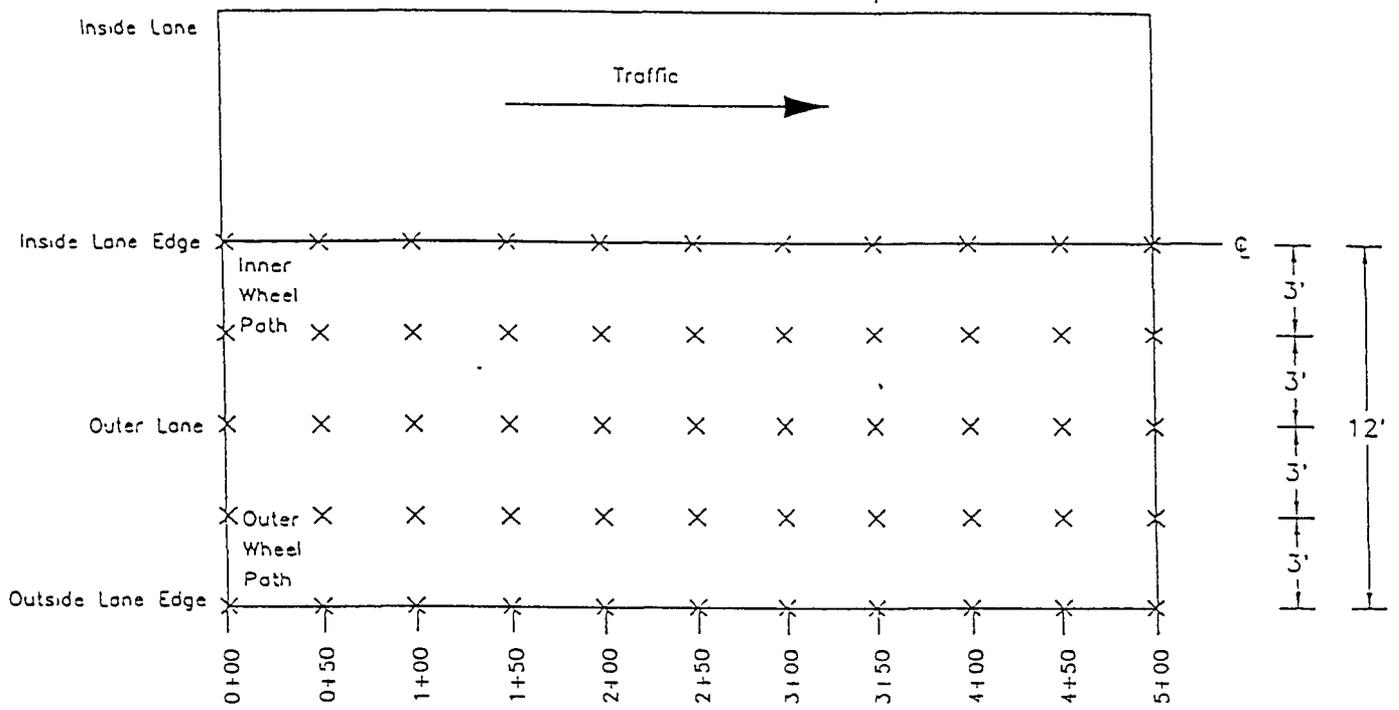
Test section elevation measurement location for Montana SPS-9A.
